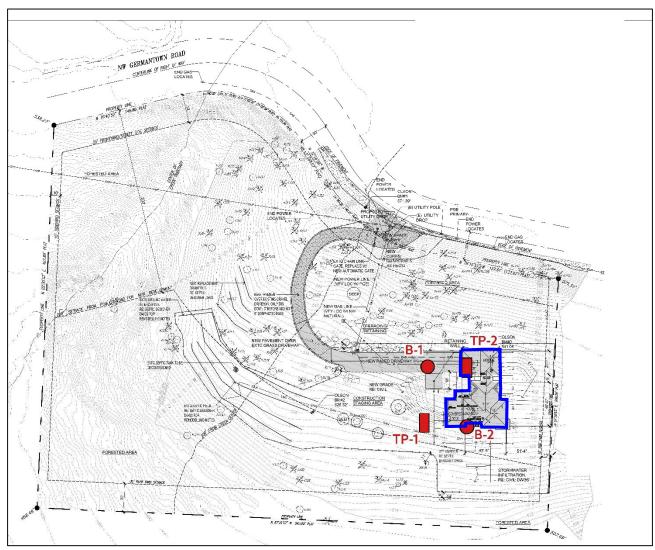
Site plan with property boundaries, topographic contours and location of proposed home footprint (outlined in solid blue) overlain with previous geotechnical study locations of borings and test pits (base drawing source: Site Plan, A1.0, by Karina E. Adams Architect, dated November 10, 2021).
